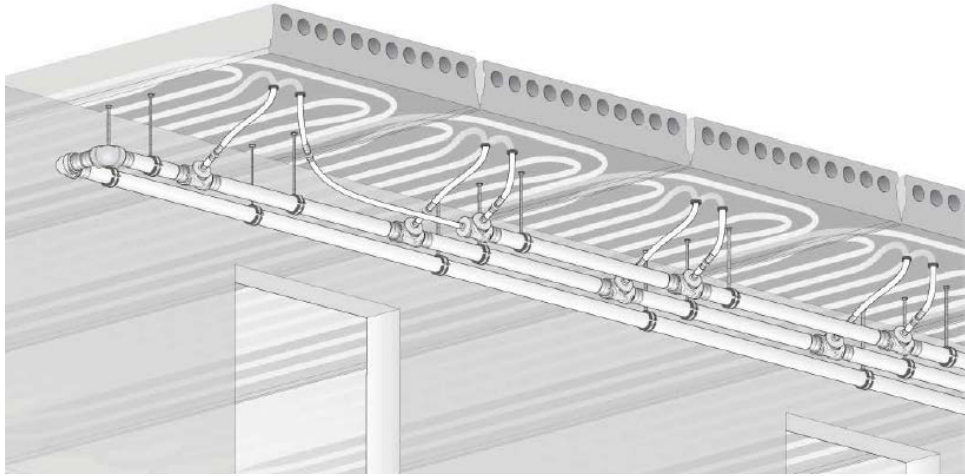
A header system is used to connect the tubing exiting the precast panel.
